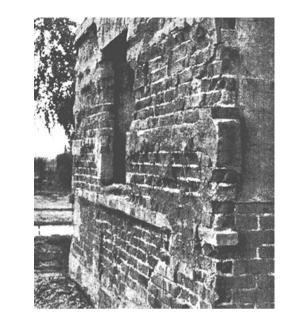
Structural damage to weathered exterior wall surfaces of "green" unfired bricks [32]
